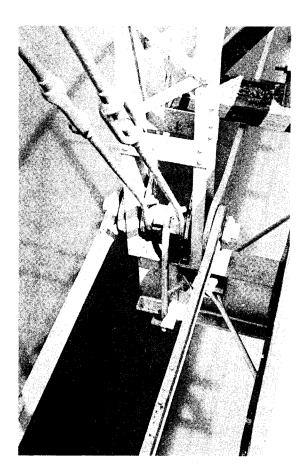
Detail of Figure 15 Pennsylvania Petit truss joint showing pinned joint with loop-welded, adjustable eyebars as well as die-forged eyebars. (Campbell County, photo no. 12520-14-17A.)
